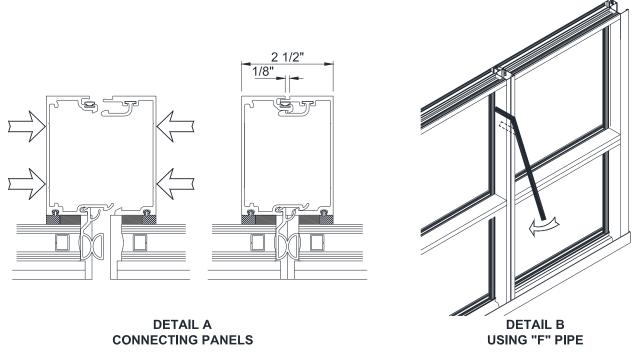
Panel Installation, Connecting Pre-Glazed Panels
